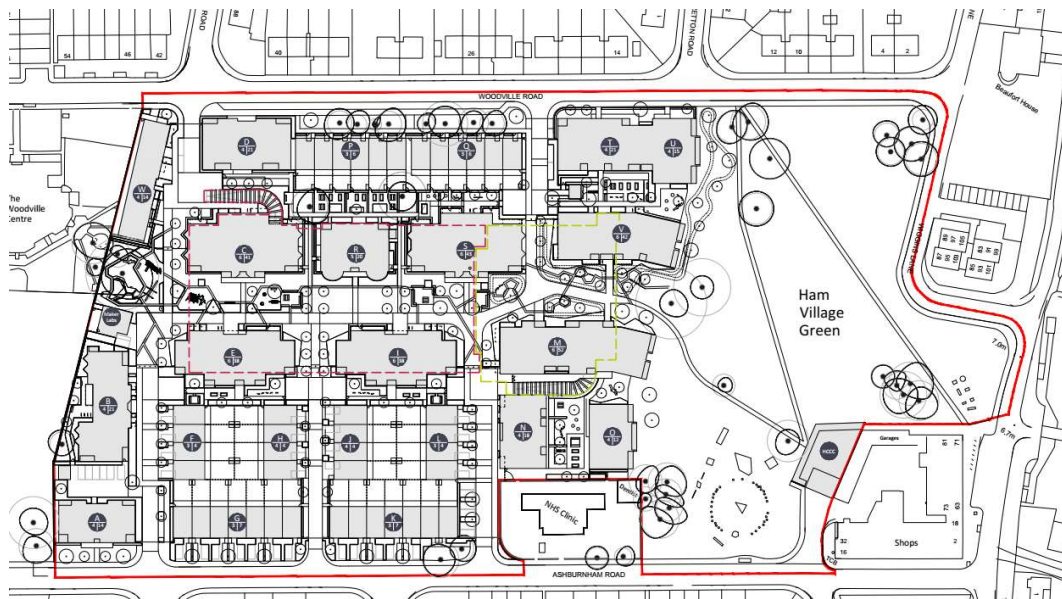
Proposed Master Plan (Source BPTW Planning Issue Masterplan)
